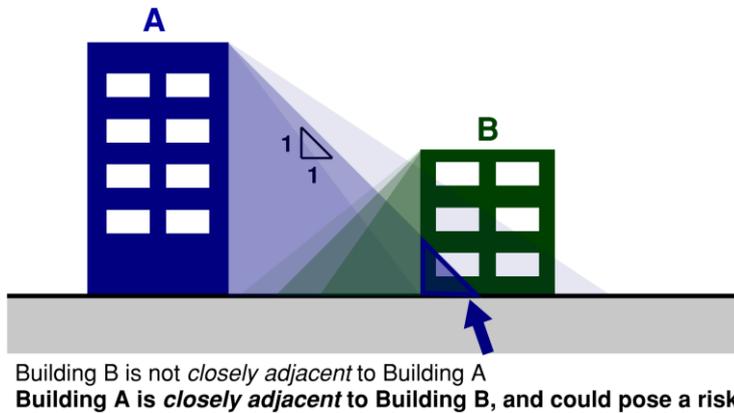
Definition of an adjacent building for earthquake risk assessment (using a 1:1 height ratio as a starting point). Building A poses a risk to building B, as it could present a hazard if it were significantly damaged or if it collapsed in an earthquake. Refer to text and footnote for comments on the height ratio (which can be reviewed).
